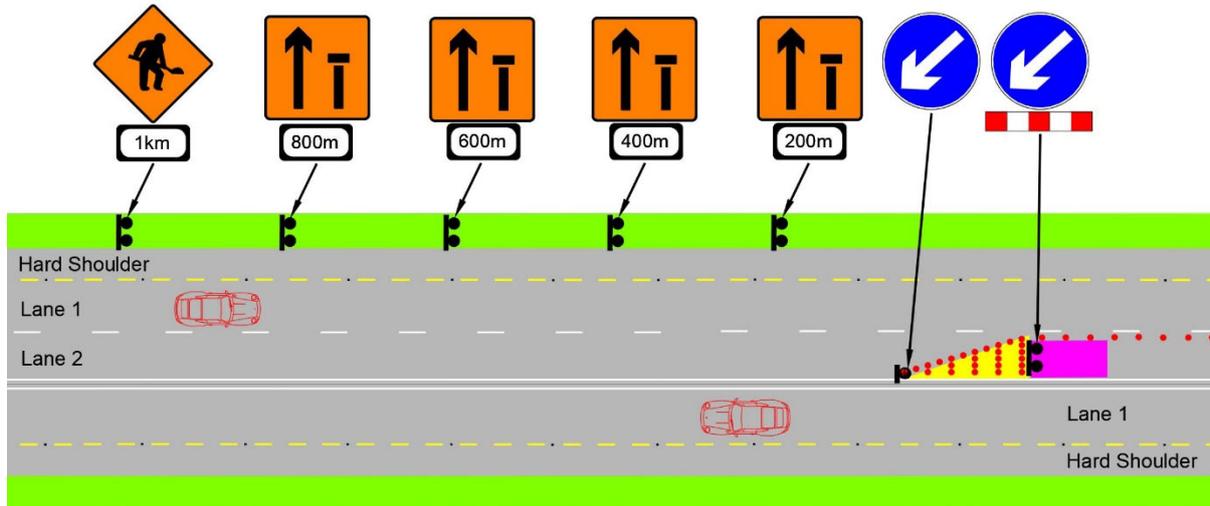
Advance Warning Signage on 2+1 Carriageway with Hard Shoulder
